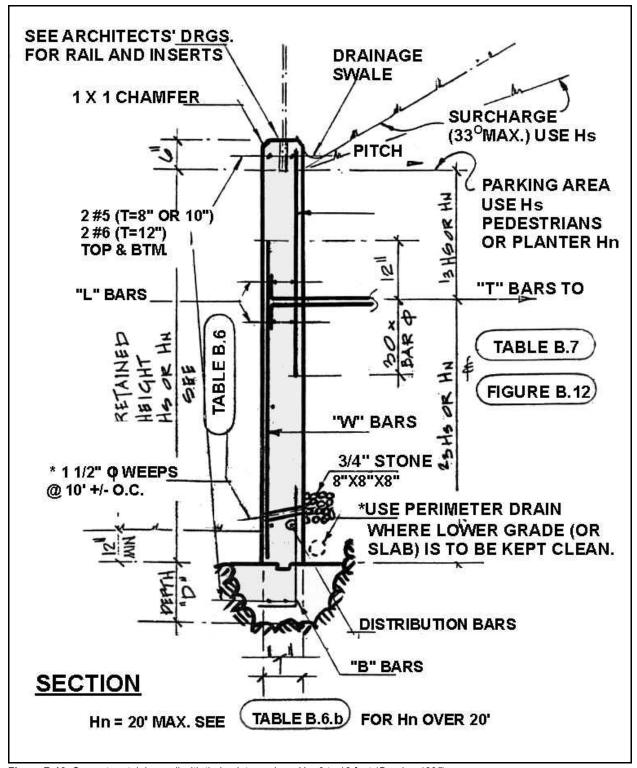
Concrete retaining wall with tie-back to anchor. H = 0 to 16 feet (Bernier, 1995).
